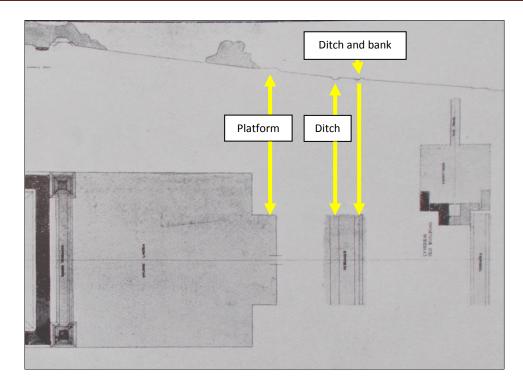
Detail of Col K C Brown's plan and profile of the gardens and buildings at Lyveden c1932.
